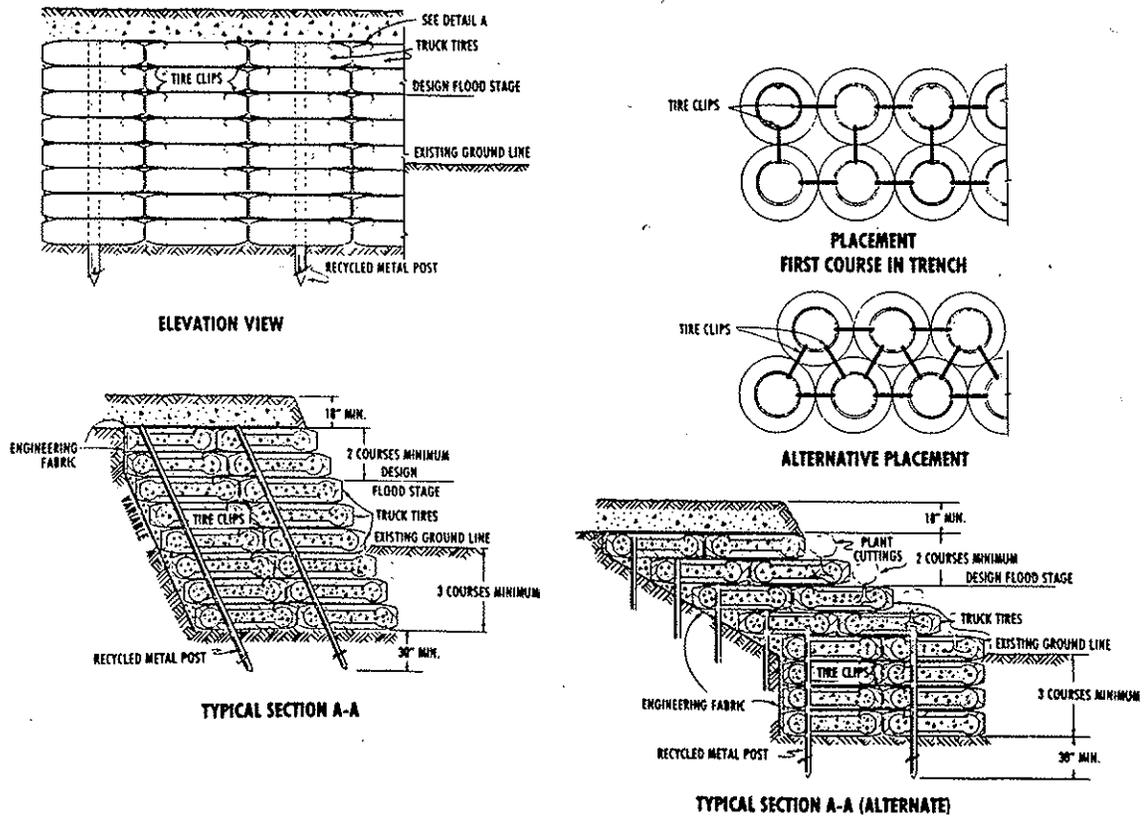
Use of whole tires to construct retaining walls (CalTrans, 1988).
